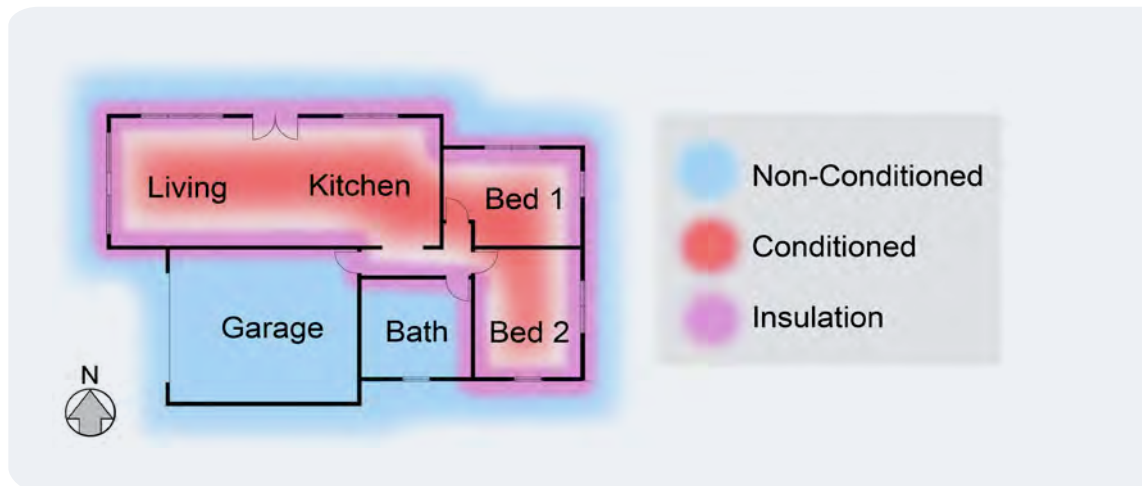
Separate conditioned rooms. Insulate internal as well as external walls to contain heating and cooling.
